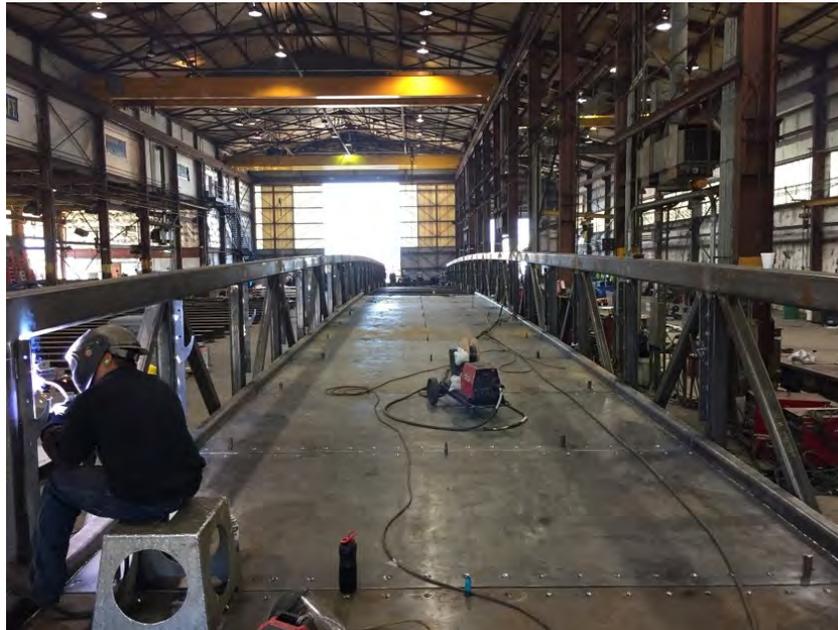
Dry fitting SPS panels on bridge prior to painting operations.
